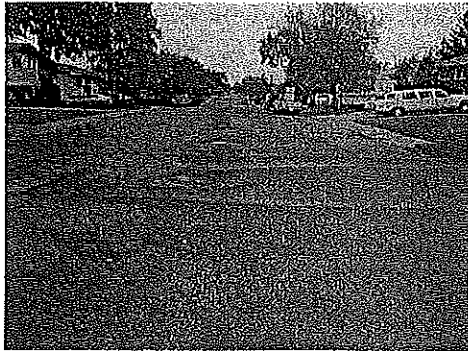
Water pooling on centreline of 5th Avenue W due to multiple overlay of asphalt
